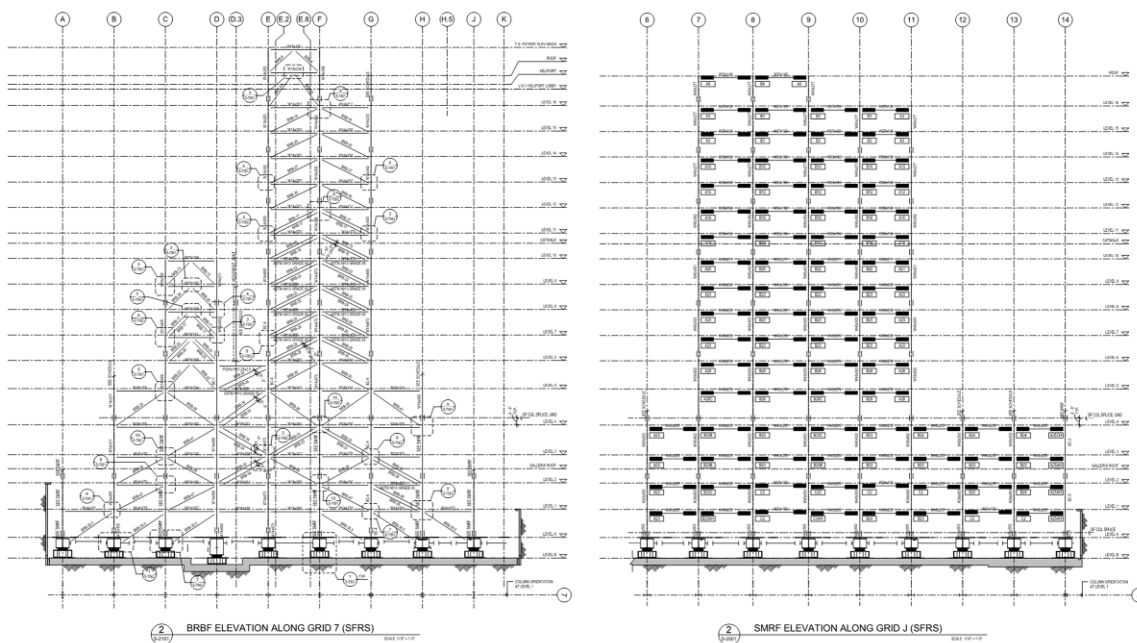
Lateral frame elevation of BRB frame (left) and SidePlate® moment frame (right)
